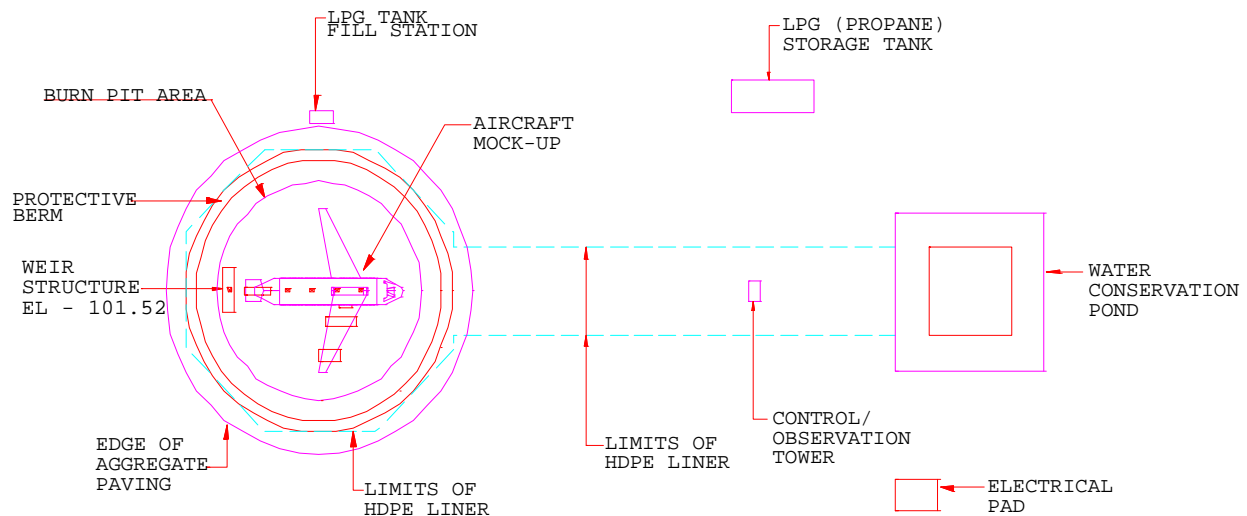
TYPICAL CRASH FIRE RESCUE TRAINING FACILITY DESIGN COMPONENTS
